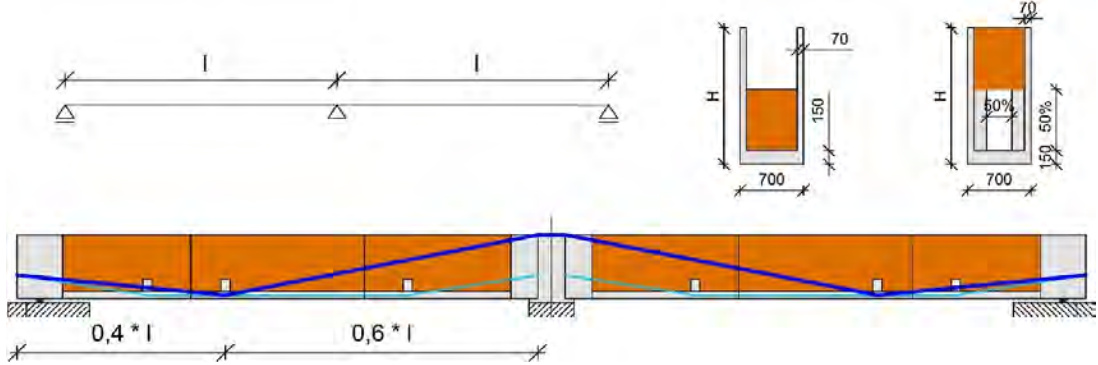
Static system, cross-sections and post-tensioning of construction phase 2 (2a and 2b)
